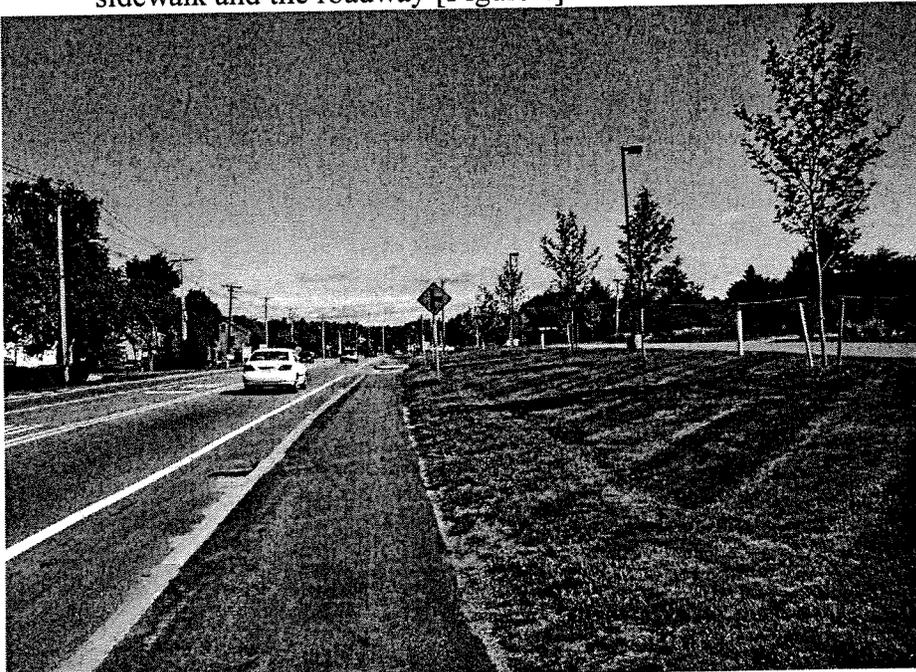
Edge of pavement, Great Road westbound in East Acton.
